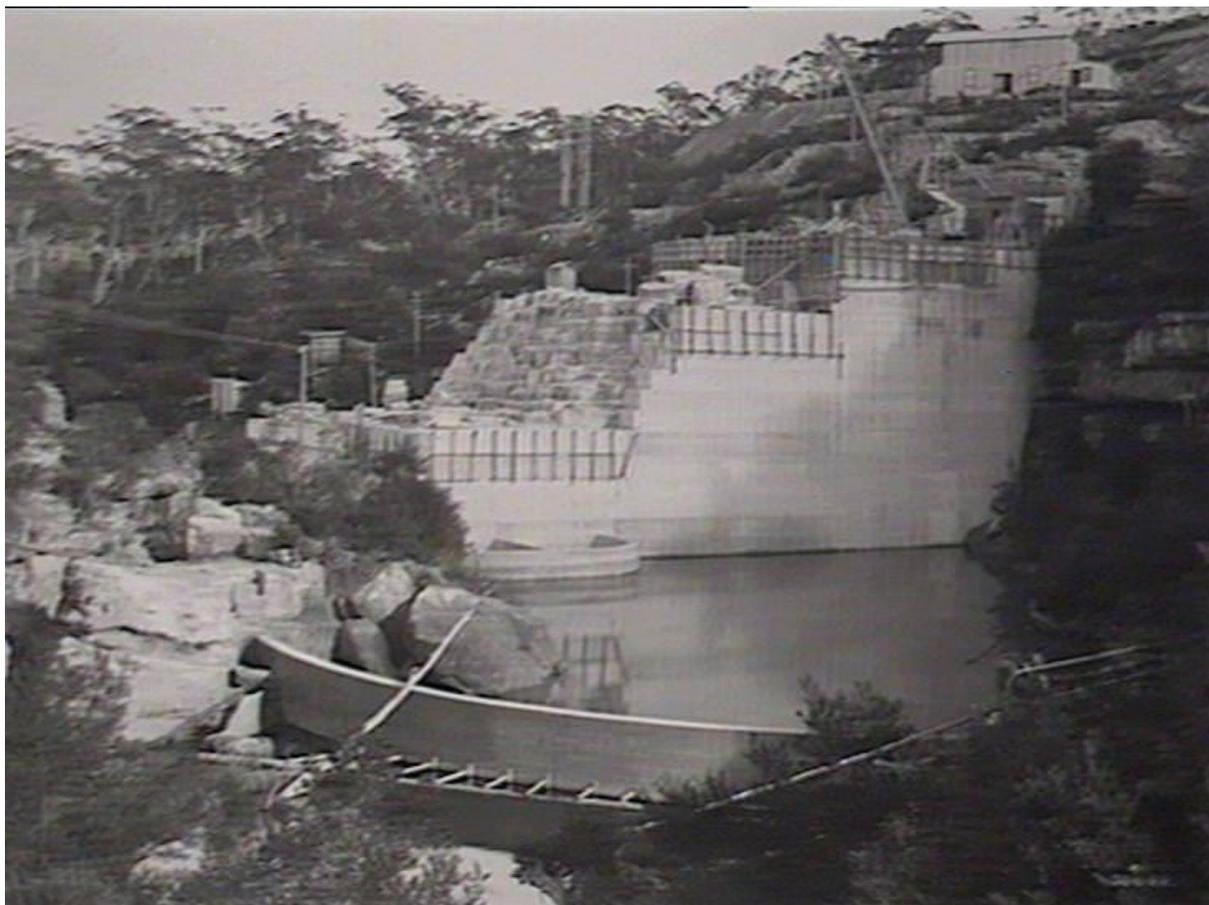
1922 image of the wall during construction (State Library of New South Wales, Cordeaux dam, Record Identifier 92ezwm0Y)
